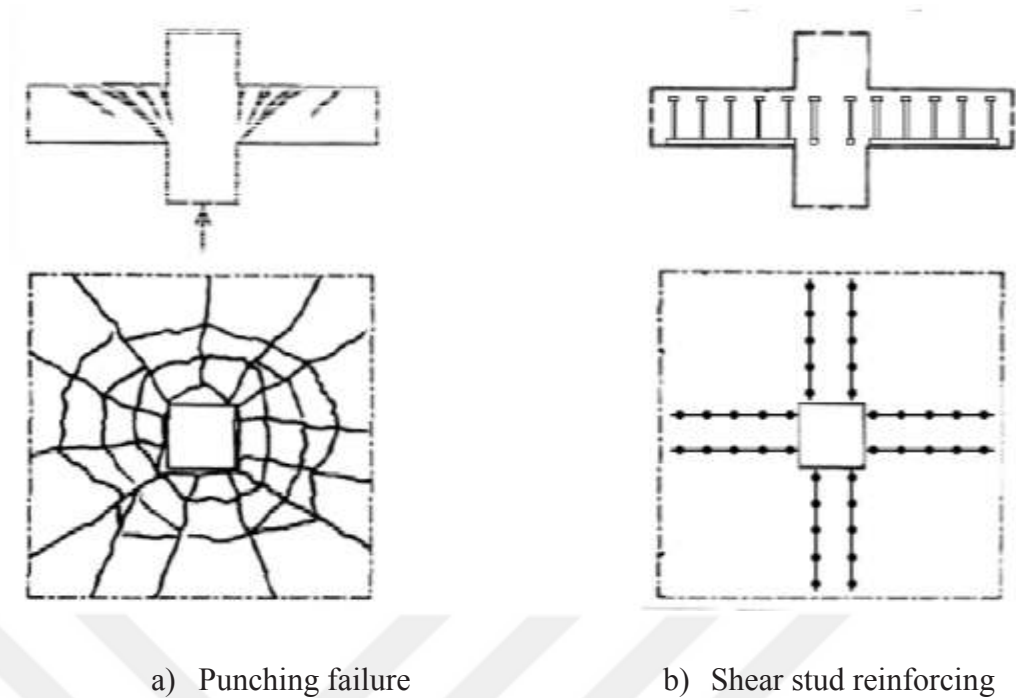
Punching failure and typically used slab shear reinforcement (Park and Gamble, 2000)
